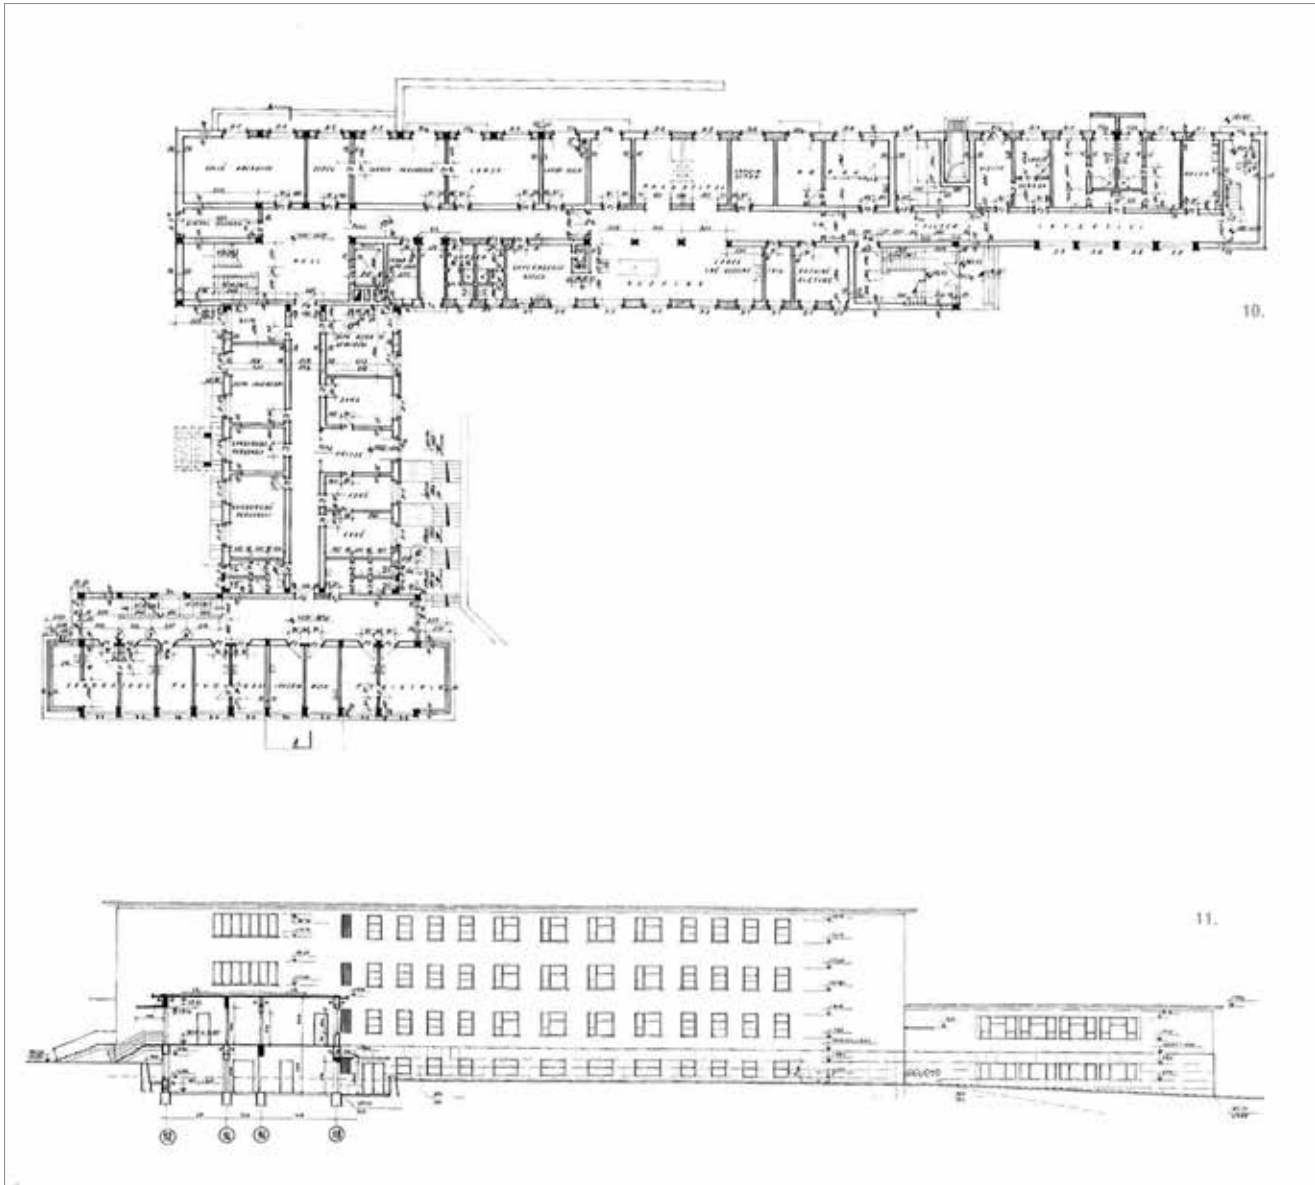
Skënder Luarasi, Çorovodë Hospital, 1969, construction documents, facade and first floor plan (TCAC).
